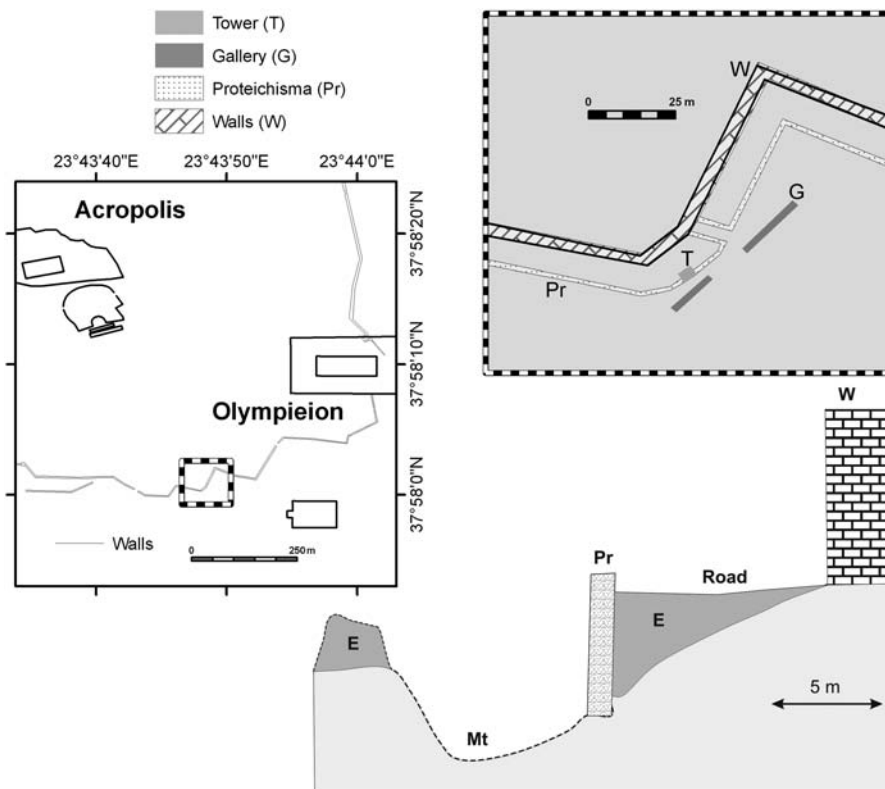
The fortification walls near the Olympieion (left), location map of a gallery sections G (top right) and schematic section through the wall (W), the ring road on earth pile (E), the proteichisma (Pr) and the moat trench (Mt) (bottom).
